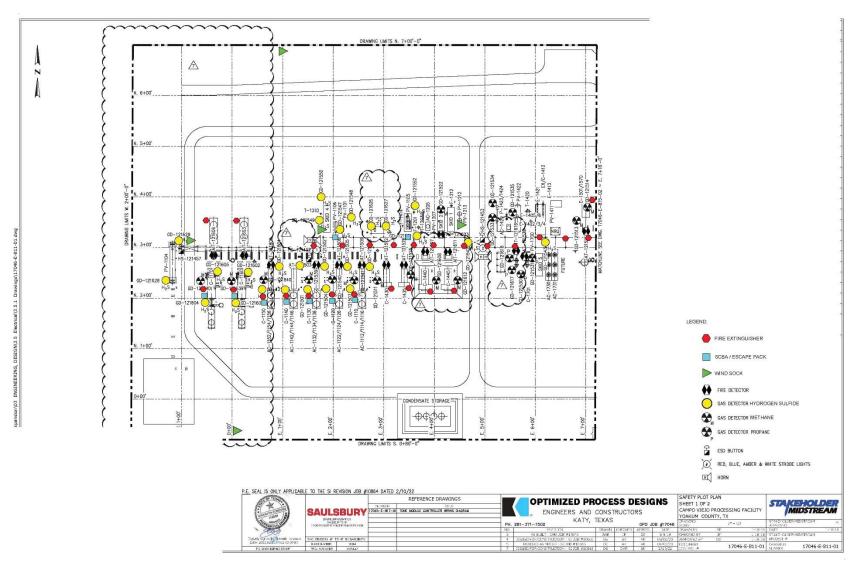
Site Plan, Campo Viejo Facility – West Section
